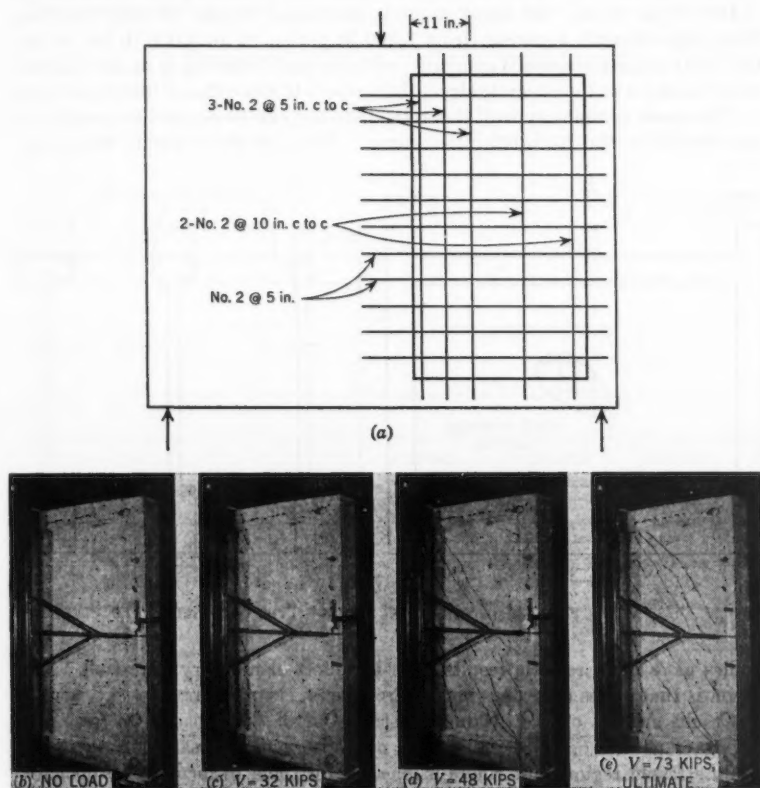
REINFORCING DETAILS AND CRACK FORMATION OF SPECIMEN VRR-7
